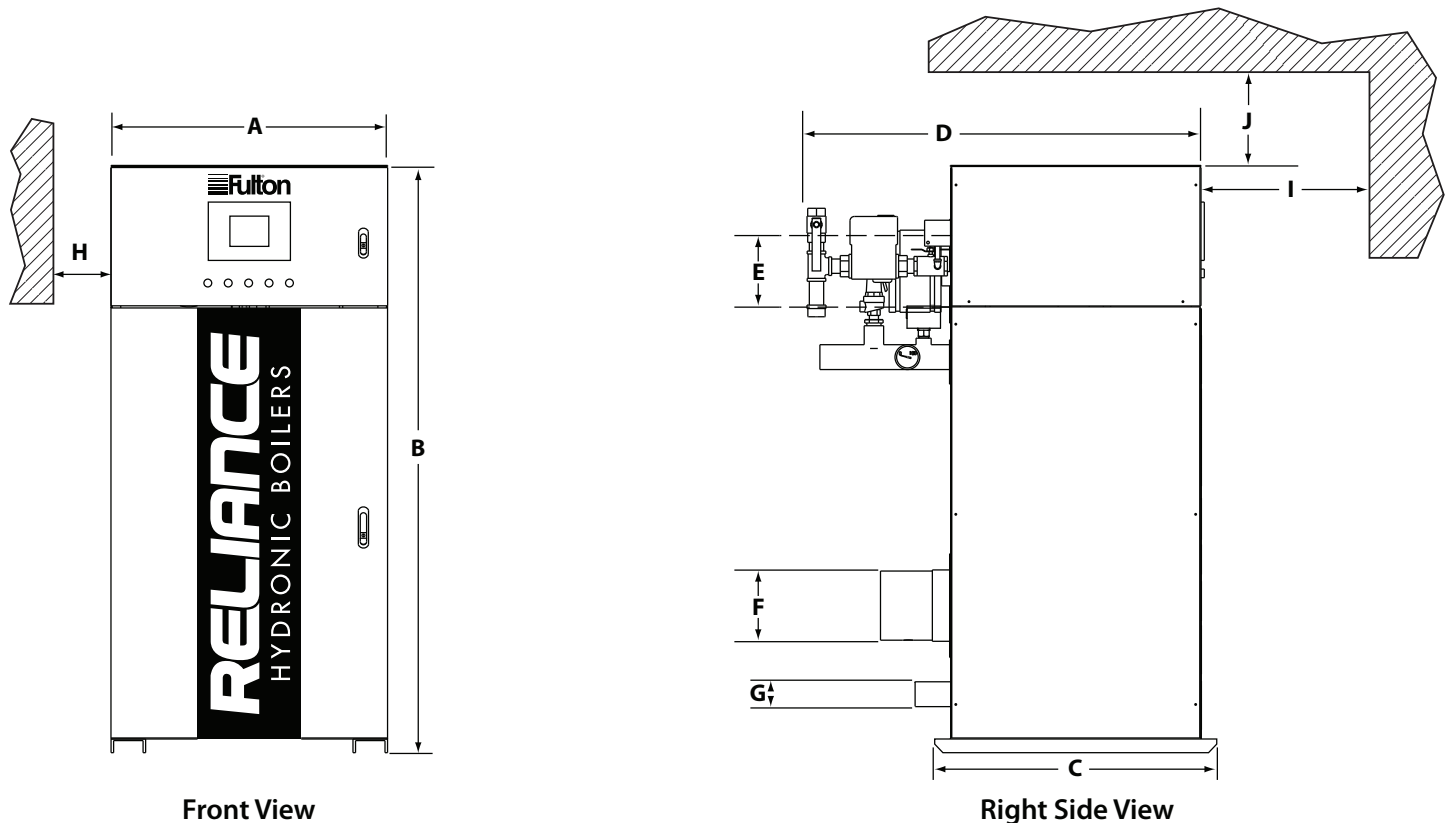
RELIANCE HYDRONIC BOILER CLEARANCES (REFER TO TABLE 1B)
